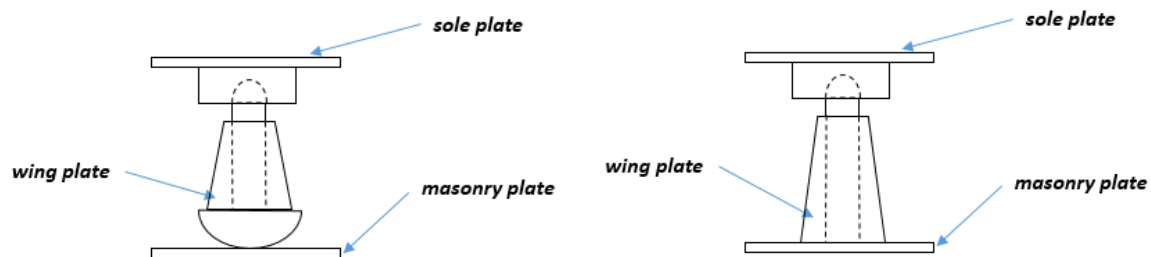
Schematic view of an expansion rocker bearing (left) and a pinned rocker bearing (right)
